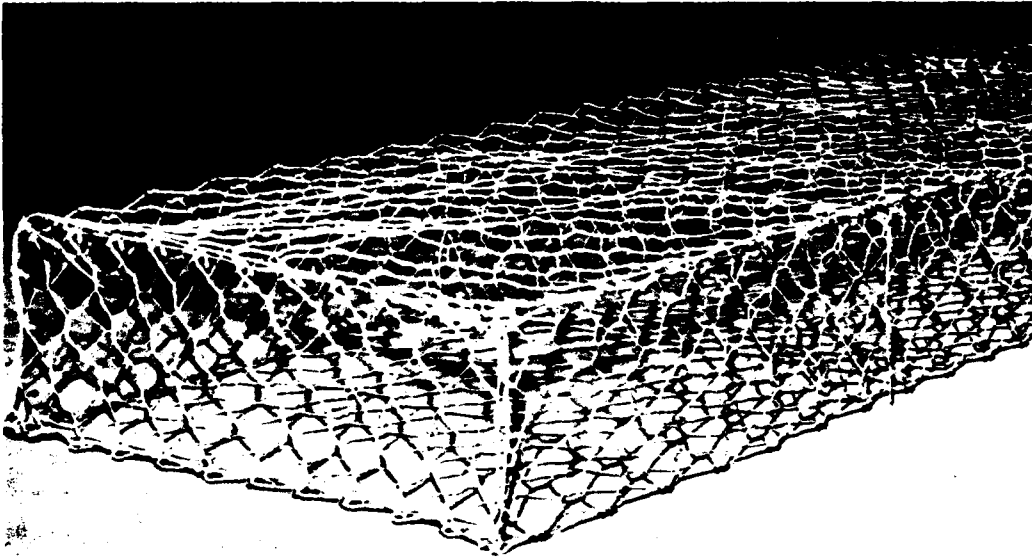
Gabion unit prior to filling with stone (after Terra Aqua Conservation, Bekaert Steel Wire Corp., 1977)
